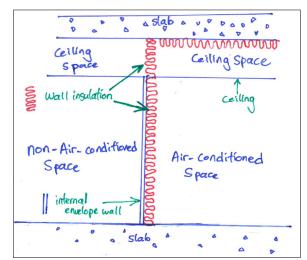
External Envelope Wall Insulation Requirement Figure 3: Internal Envelope Wall Insulation Requirement
